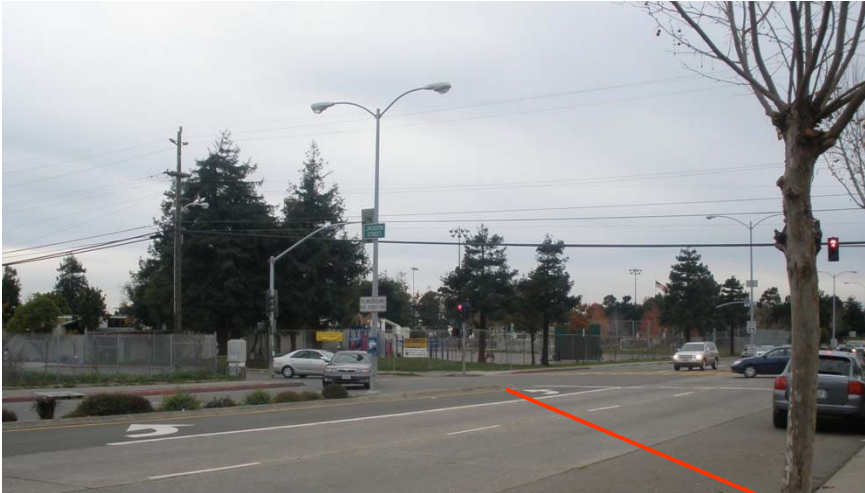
Proposed Gateway Site at Buchanan and Jackson streets, looking west
